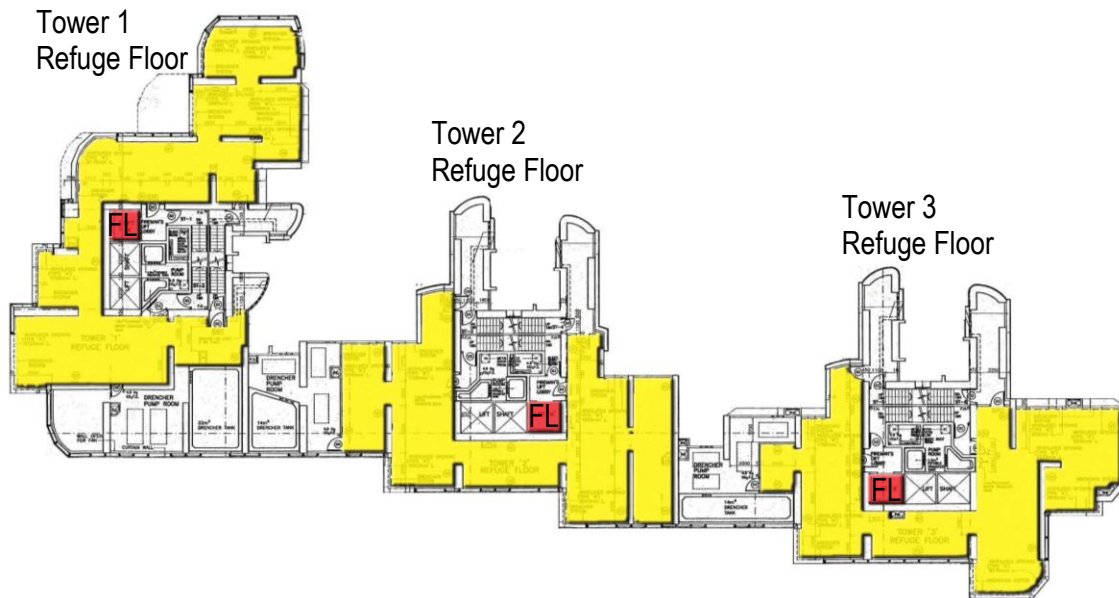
Level 22, refuge floor (DLN Architects & Engineers 2001e)
